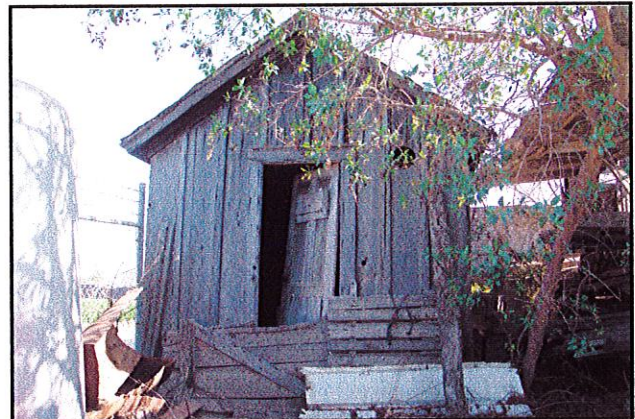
One-story building, post-1950, located at the north end of the Ancillary Barns/Storage Building Group. This view is facing east, toward the west (primary) elevation. Note board-and-batten exterior wall cladding. Photograph date, November 5, 2002.
